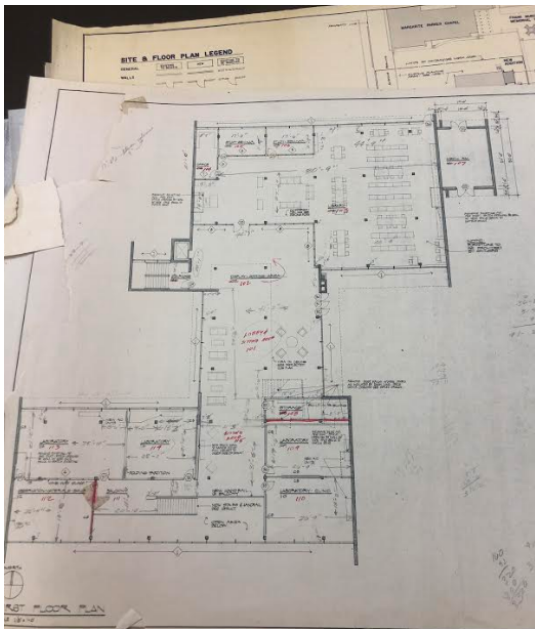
The 1979 plans to remodel the Storch first floor (Office of University Architect 1979).
